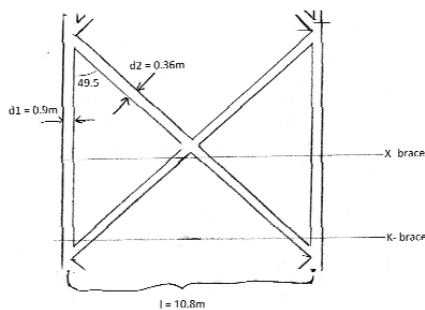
X- and K-brace positions shown on a side panel of the truss tower.
